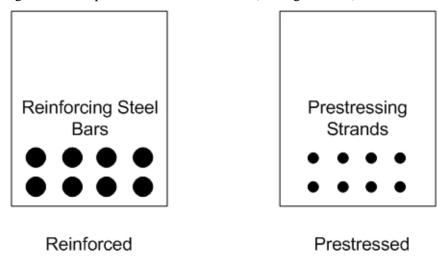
Non-prestressed Mild Steel Reinforced Concrete vs. Precast Prestressed Concrete
